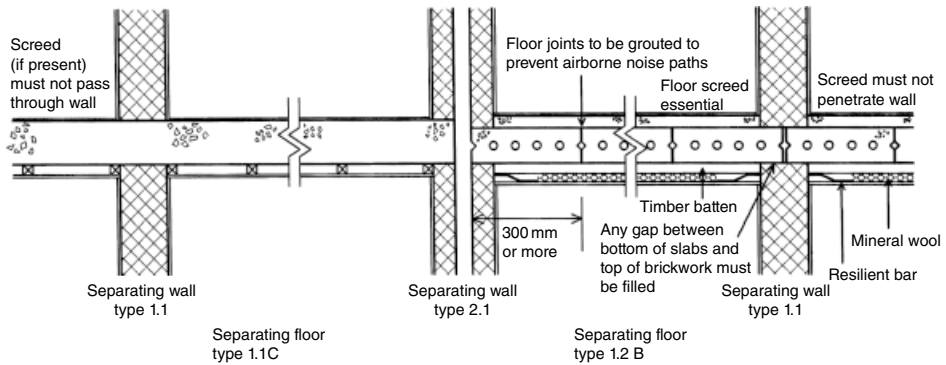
Details of junctions between Type 1 separating floors and Type 1 and 2 separating walls.
